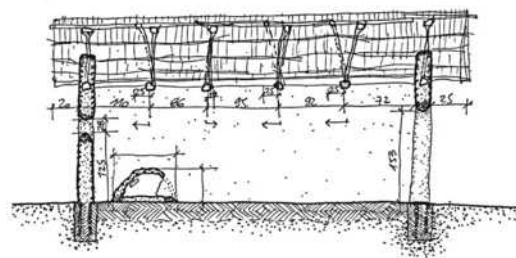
The south-western corner and wall structure sited in the foundation trenches. Sultana-Malu Roșu experiment.
